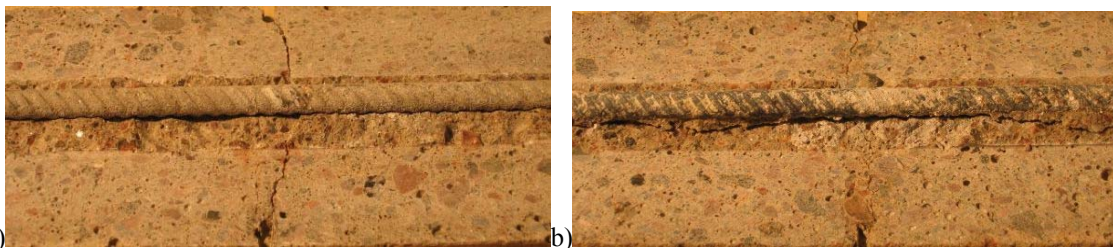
a) Corroded hot-dip galvanised reinforcement beam specimen (crack width $w = 0.15$ mm) after five years of exposure to tap water (Finnish cold-worked ribbed steel reinforcement bar B500K/Ø8) and b) Corroded hot-dip galvanised reinforcement (crack width $w = 0.15$ mm) after five years of exposure to sodium chloride solution (Finnish cold-worked ribbed steel reinforcement bar B500K/Ø8).
